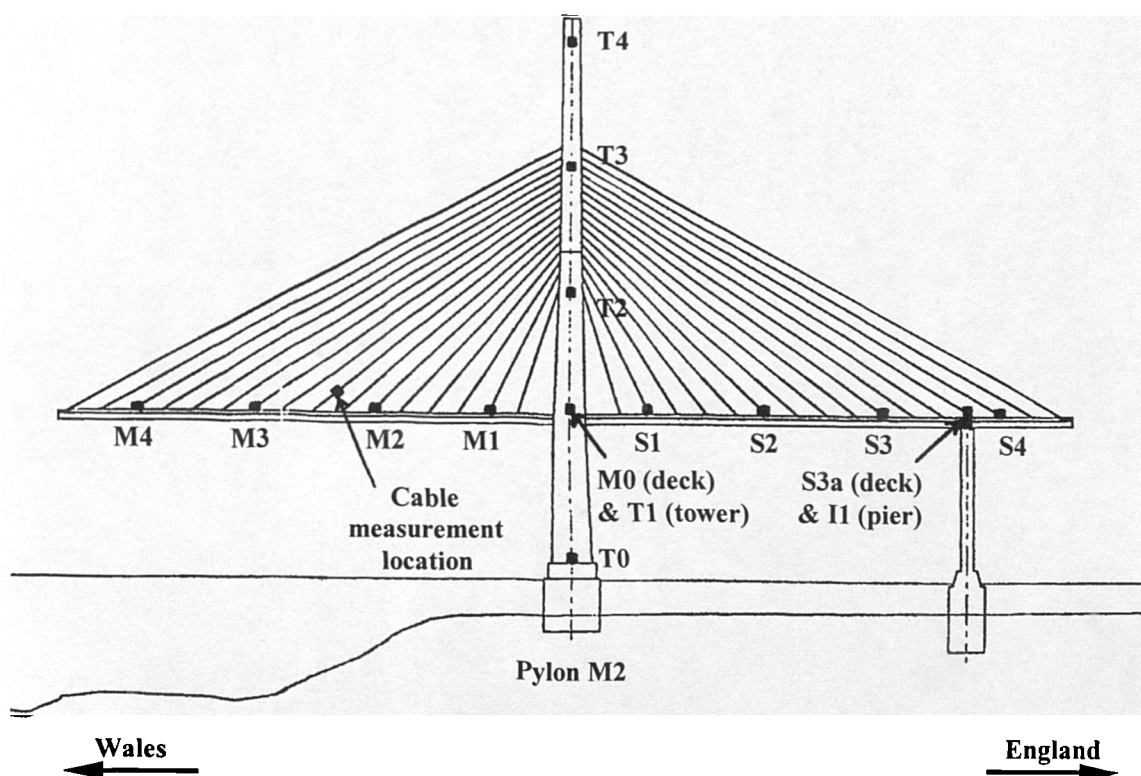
Instrument locations for M2 preliminary tests (south elevation)
